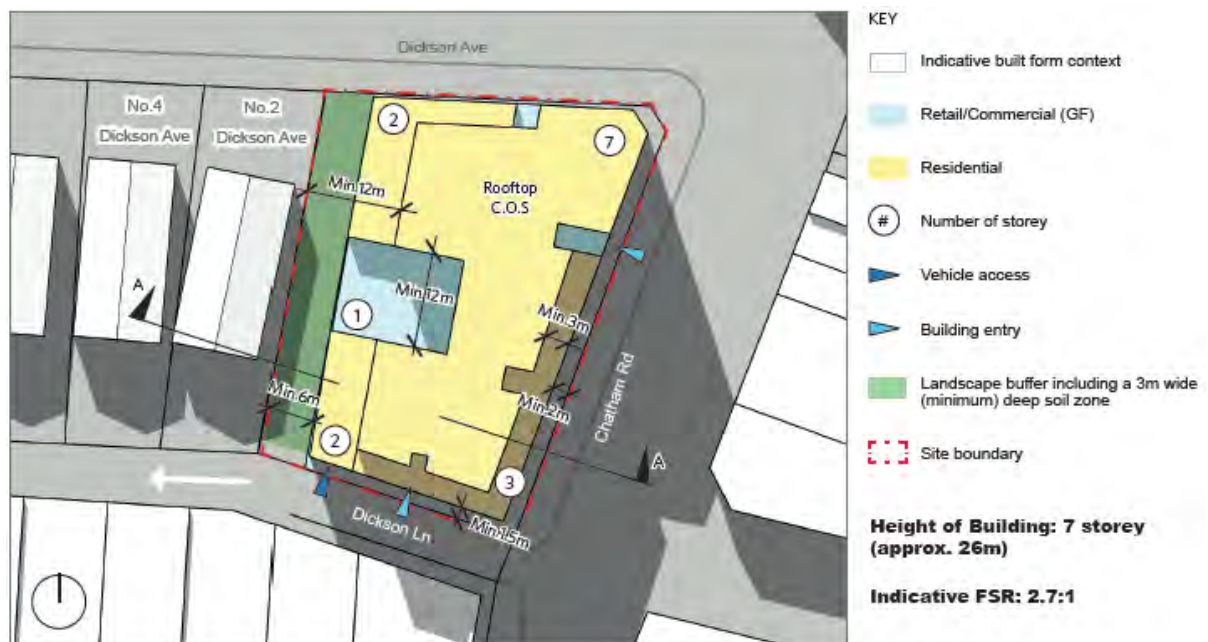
Recommended built form outline plan from the Built Form Strategy study
